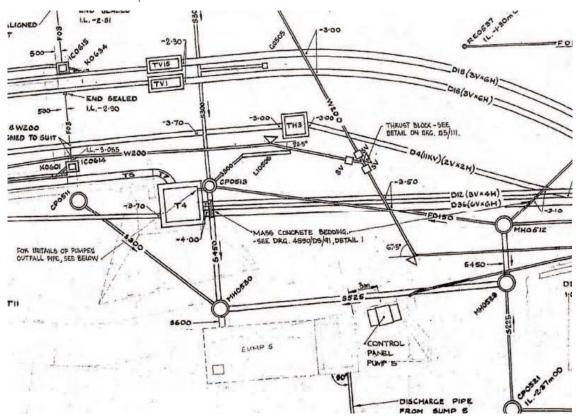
DRAINAGE LAYOUT AT EAST PORTAL
